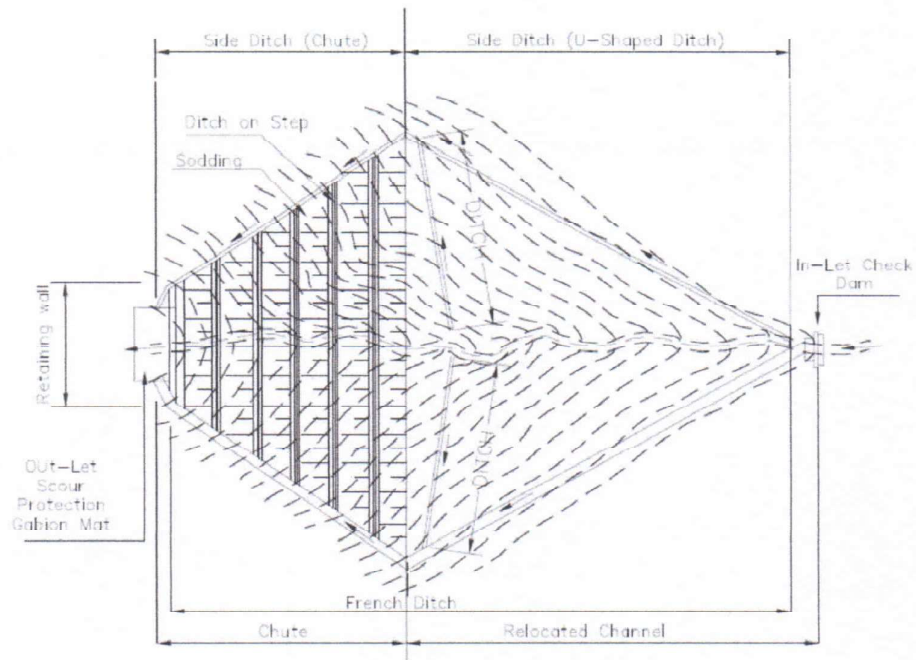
(a): Typical Arrangement for Spoil Banks: Plan
